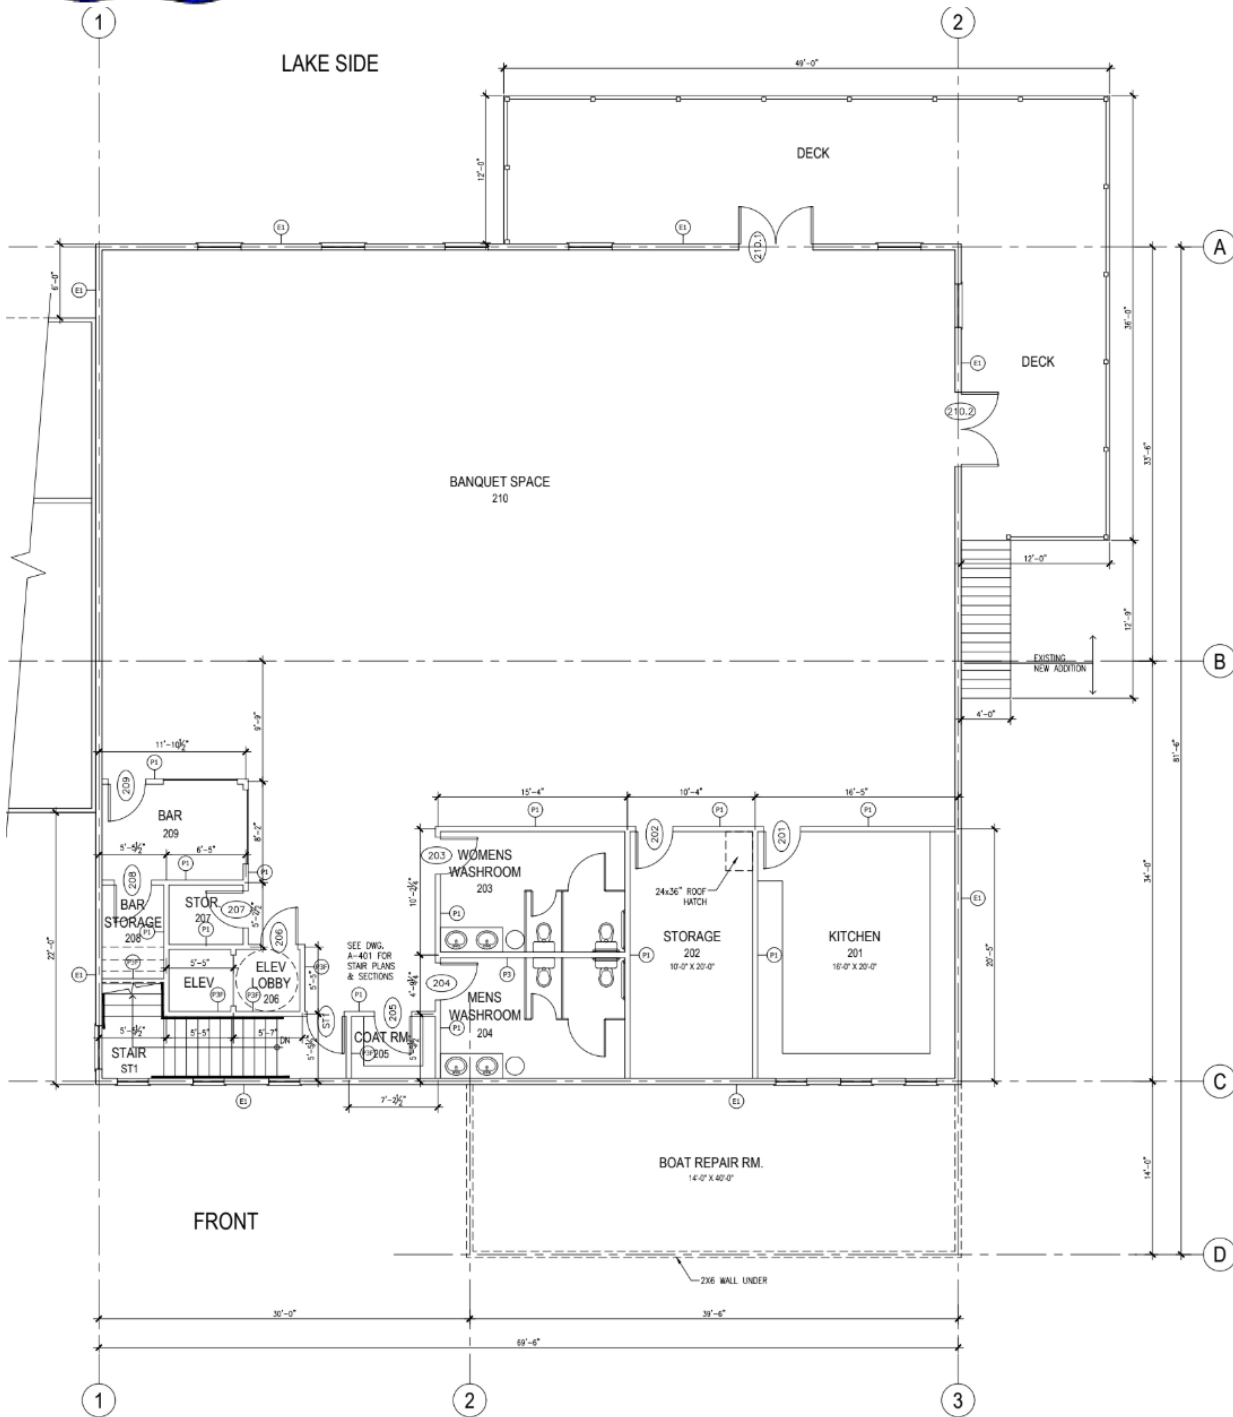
Sample from Construction Plans, Upper Floor Plan A-103
